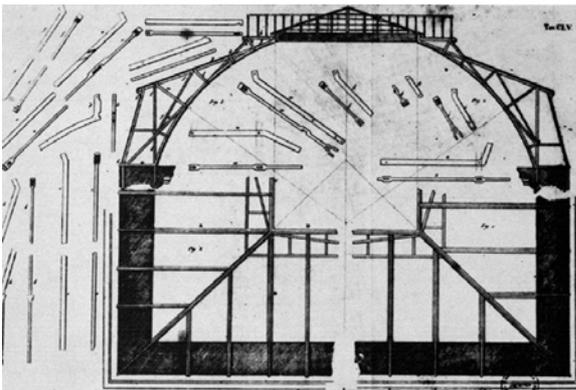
Wrought-iron roof structure of the roof over the Salon adjoining the Grande Galerie of the Louvre, Paris, Auguste Rénard, 1789. (Steiner)
